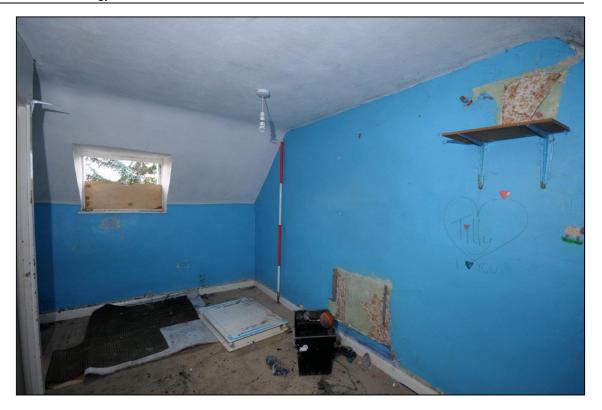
No. 41, bedroom 2, looking south-east (Scale 2m)
